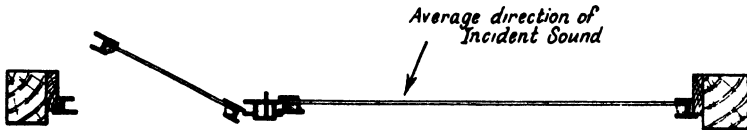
WINDOW TESTED FOR SOUND-INSULATION WITH ONE SECTION OPEN
